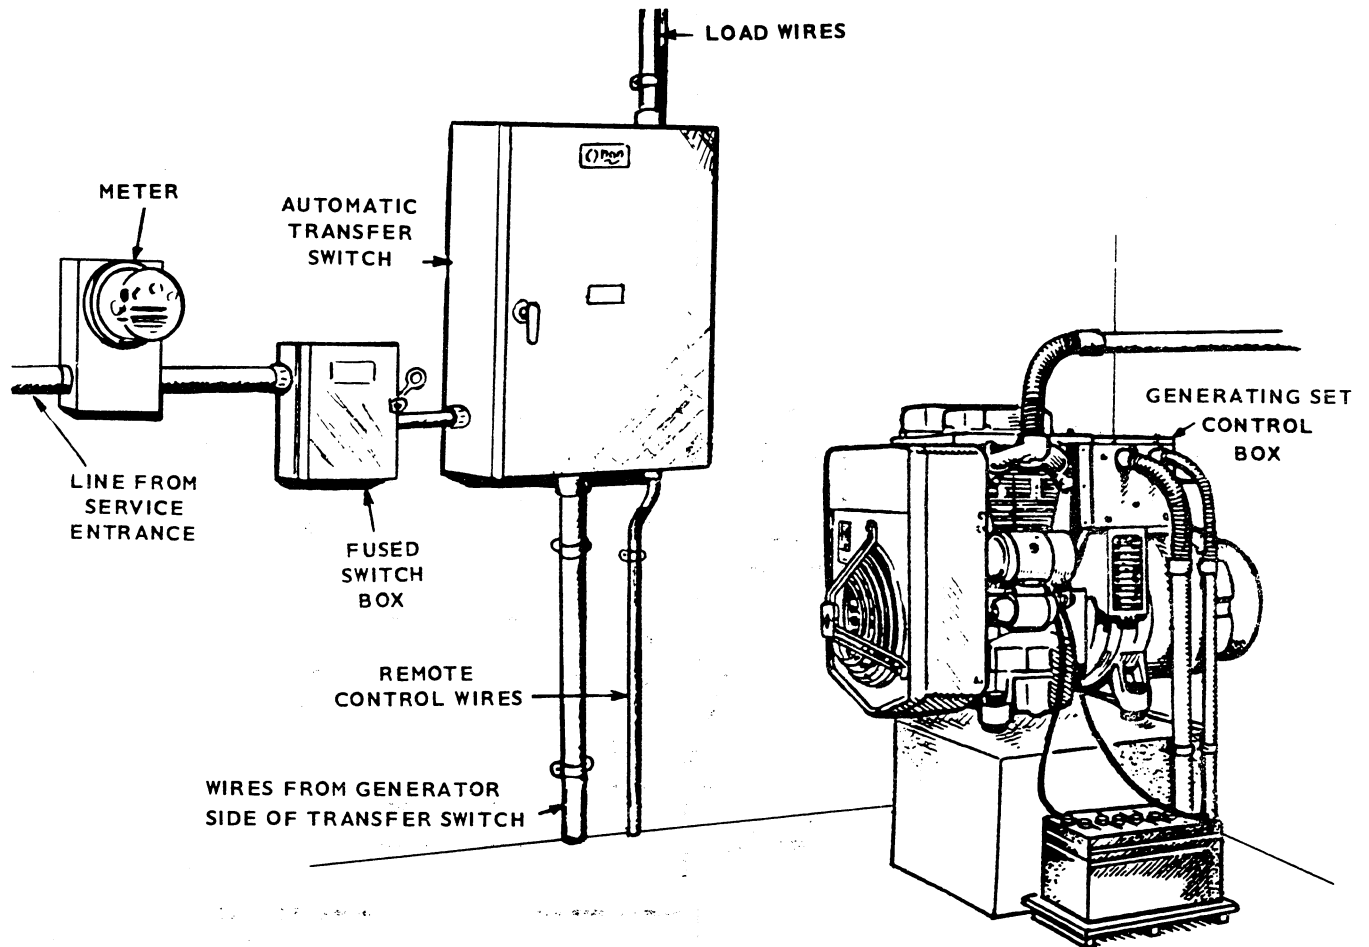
TYPICAL AUTOMATIC TRANSFER SWITCH INSTALLATION
